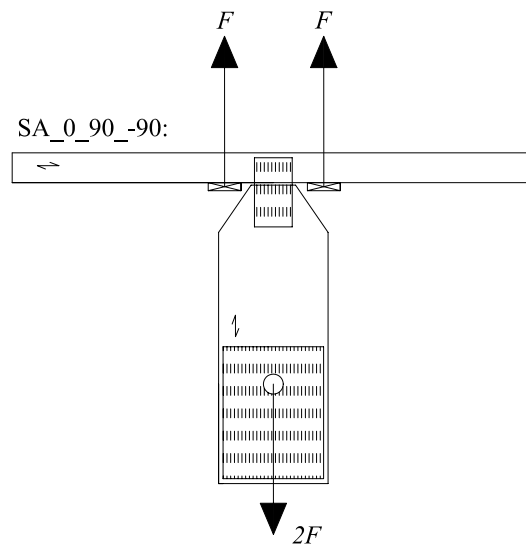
Test specimens where the risk for timber failure is eliminated.
